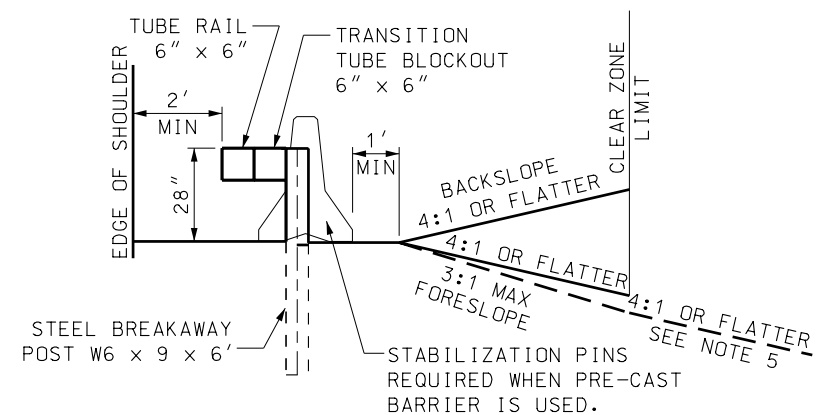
DETAIL WHEN SYSTEM IS INSTALLED WITH CONSTANT SLOPE BARRIER
